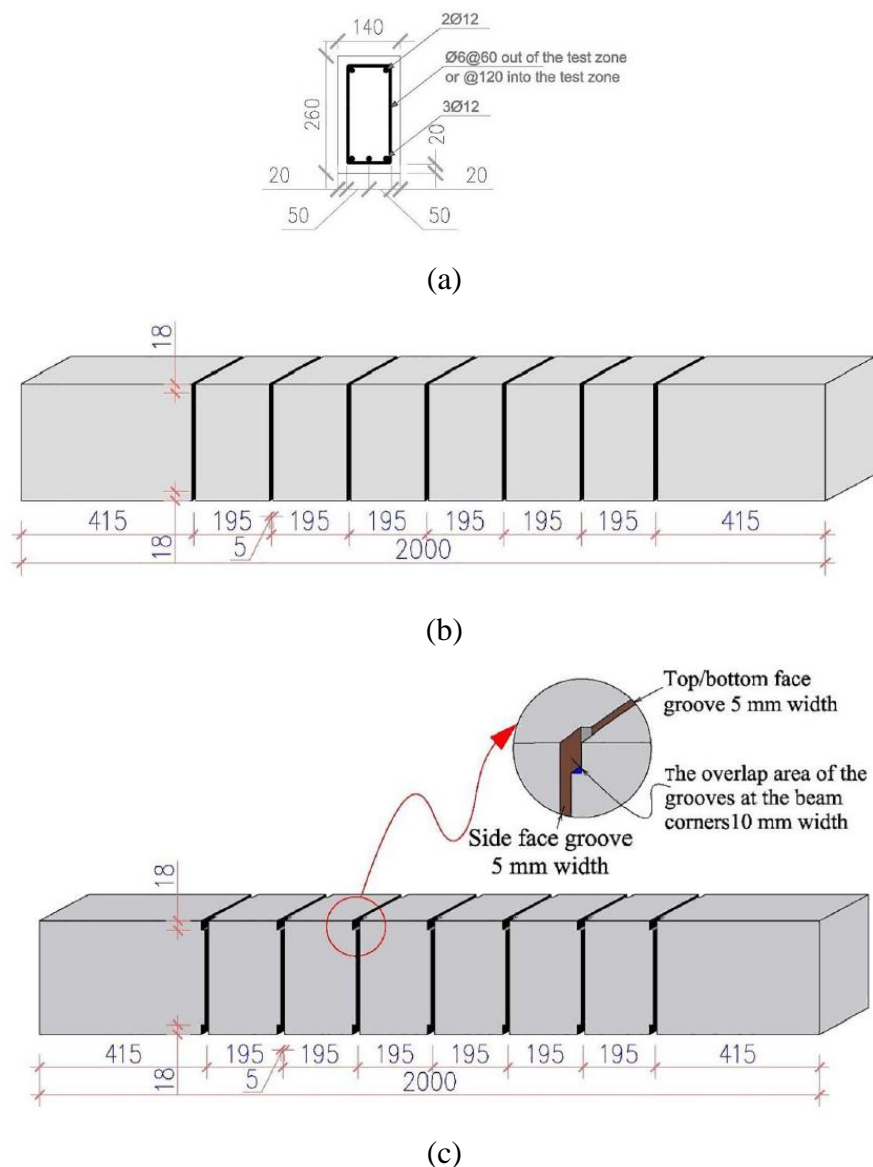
(a) Cross sectional details (b) Strengthening details of beams with CFRP ropes and (c) Strengthening detail of beams with CFRP laminates, Al-Bayati et al. (2018)
